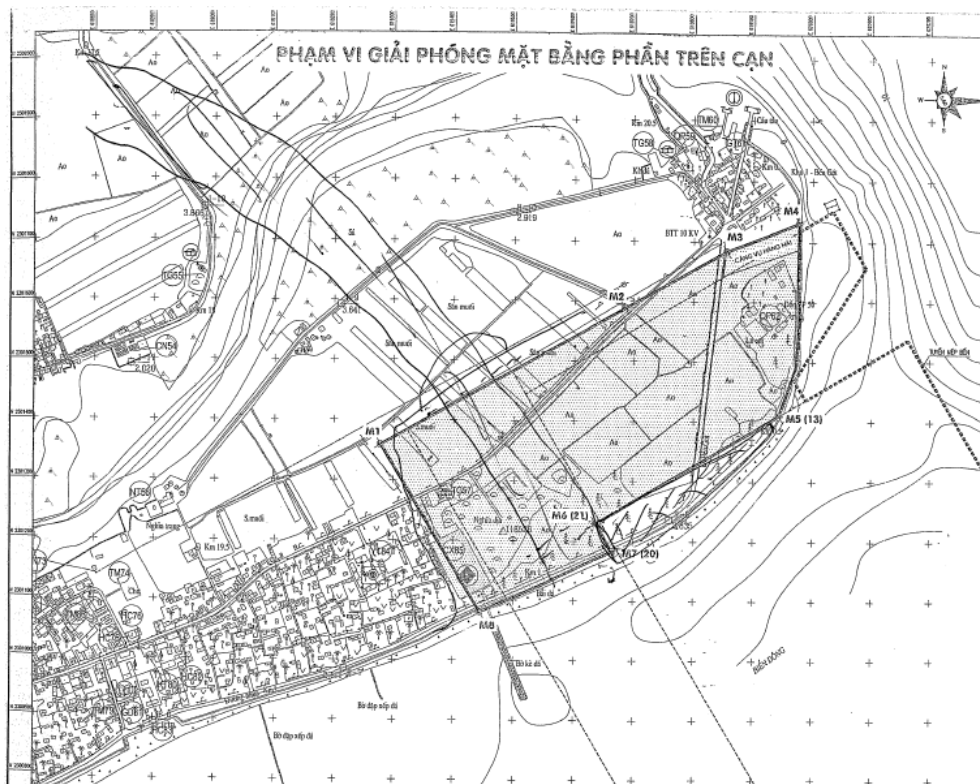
Component A - Adjustment on LH Port Construction Investment Project
